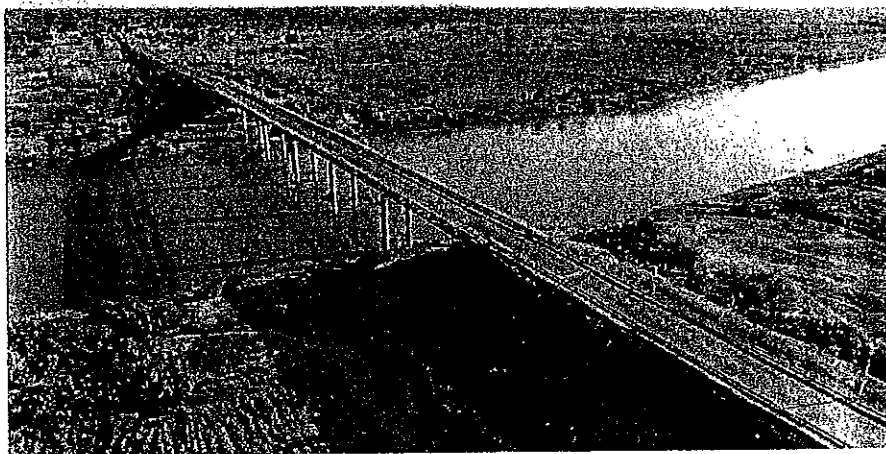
Aerial view of Buipe Bridge over Black Volta, towards south
